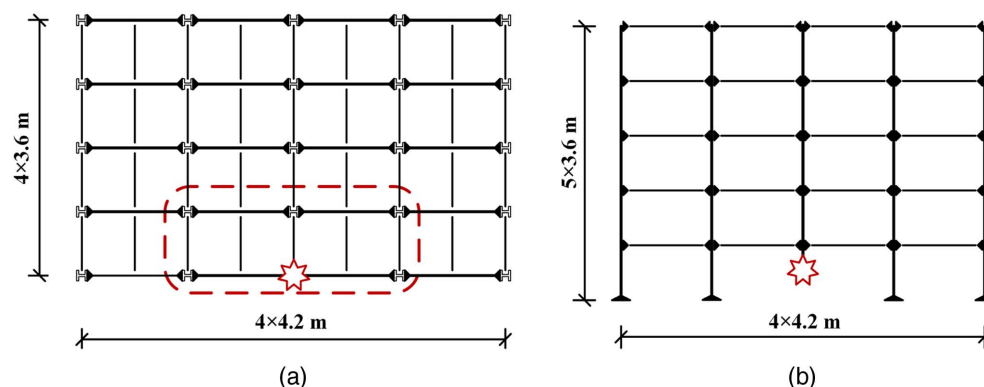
Prototype structure: (a) plan view; and (b) elevation view.
